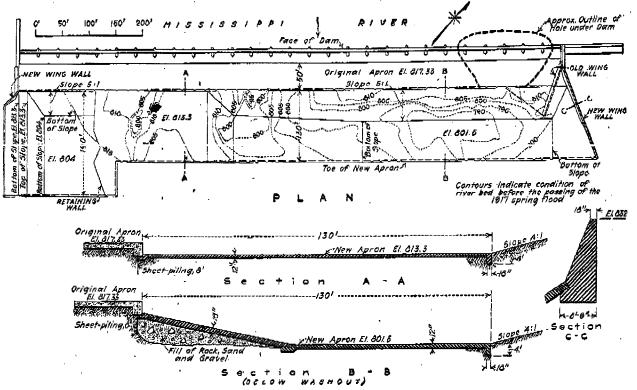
FIVE BAYS OF DAM UNDERMINED BY WASHOUT-NEW APRON BUILT OVER SCOURED-OUT AREA
